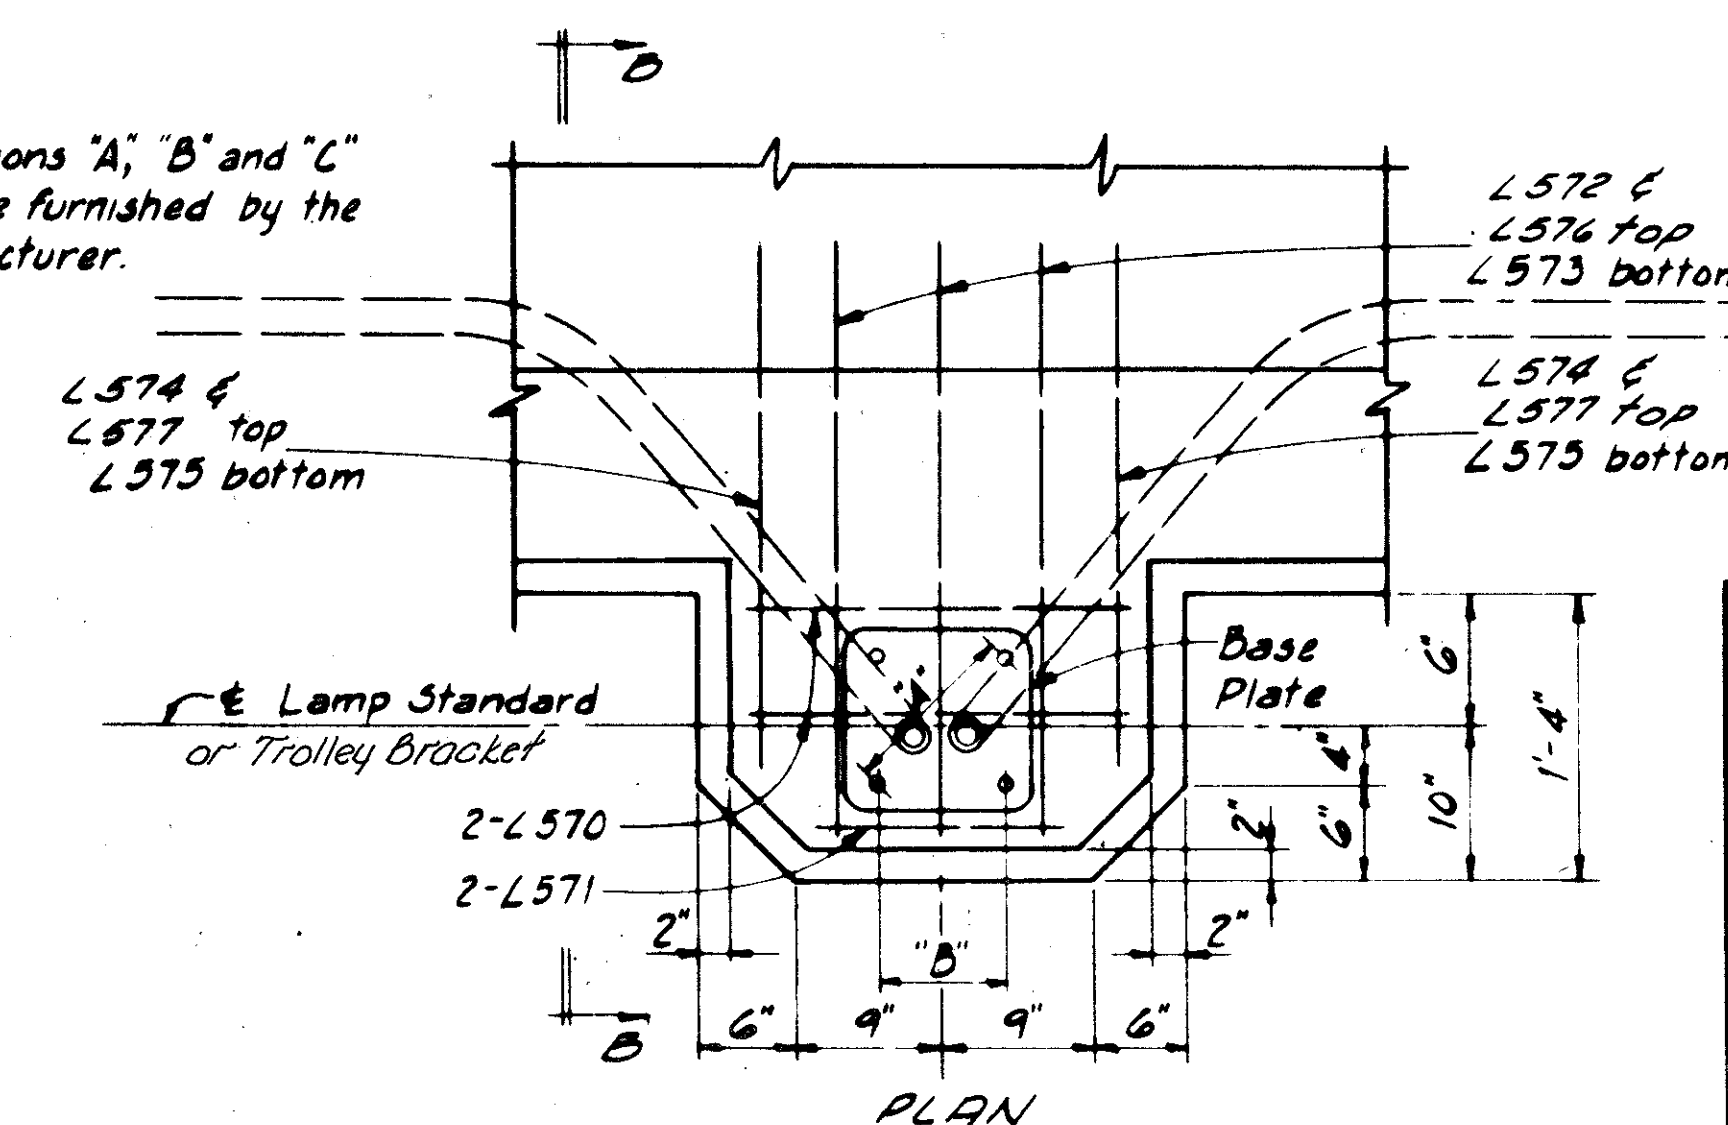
### DETAIL OF LIGHTING CONDUIT AT ABUTMENT
